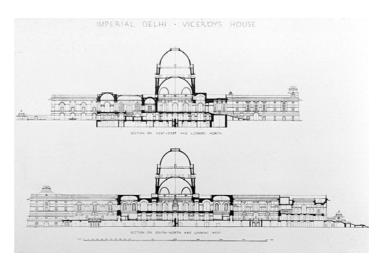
"Imperial Delhi –Viceroy's House" Section Drawing from West-East and South-North.
